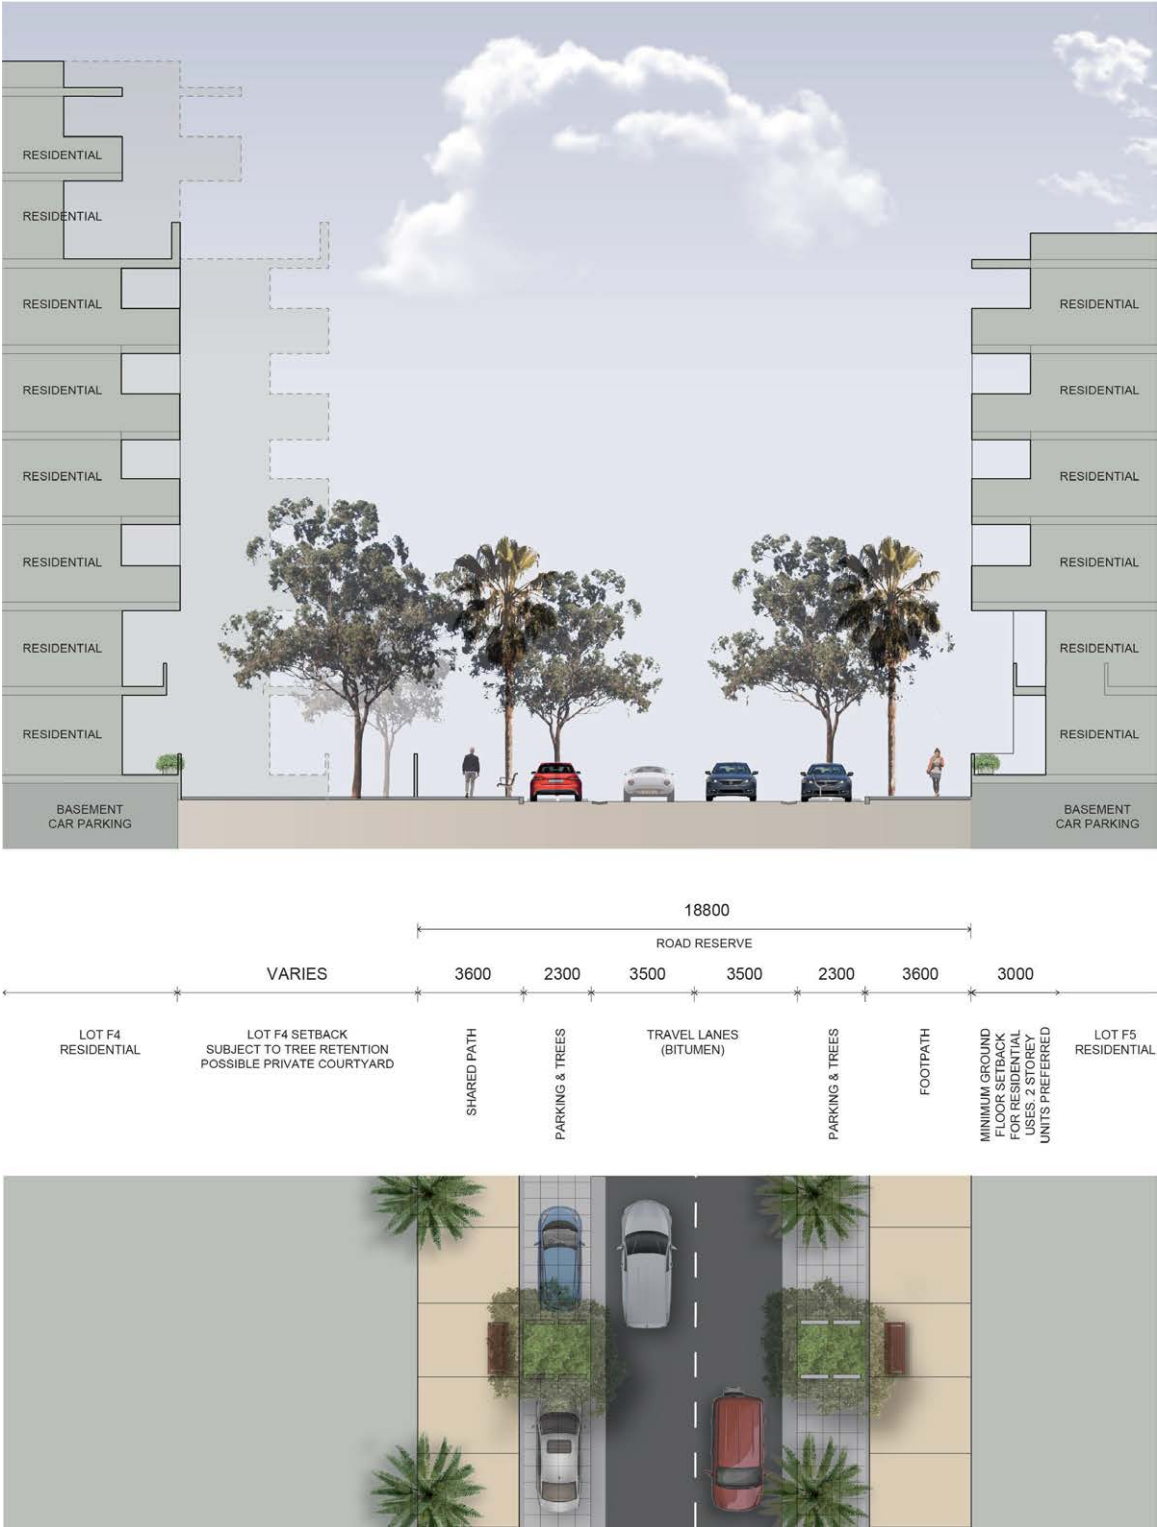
Typical street section 5 – Warrinya Avenue
